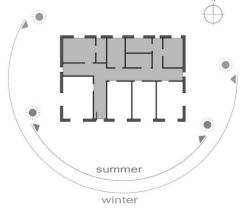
Double deep plan. Only 50% of the house can benefit from solar gan and light penetration.
